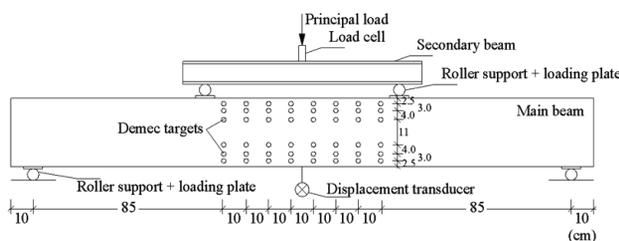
Set-up for testing beam specimen (Bernardo et al. 2014)
